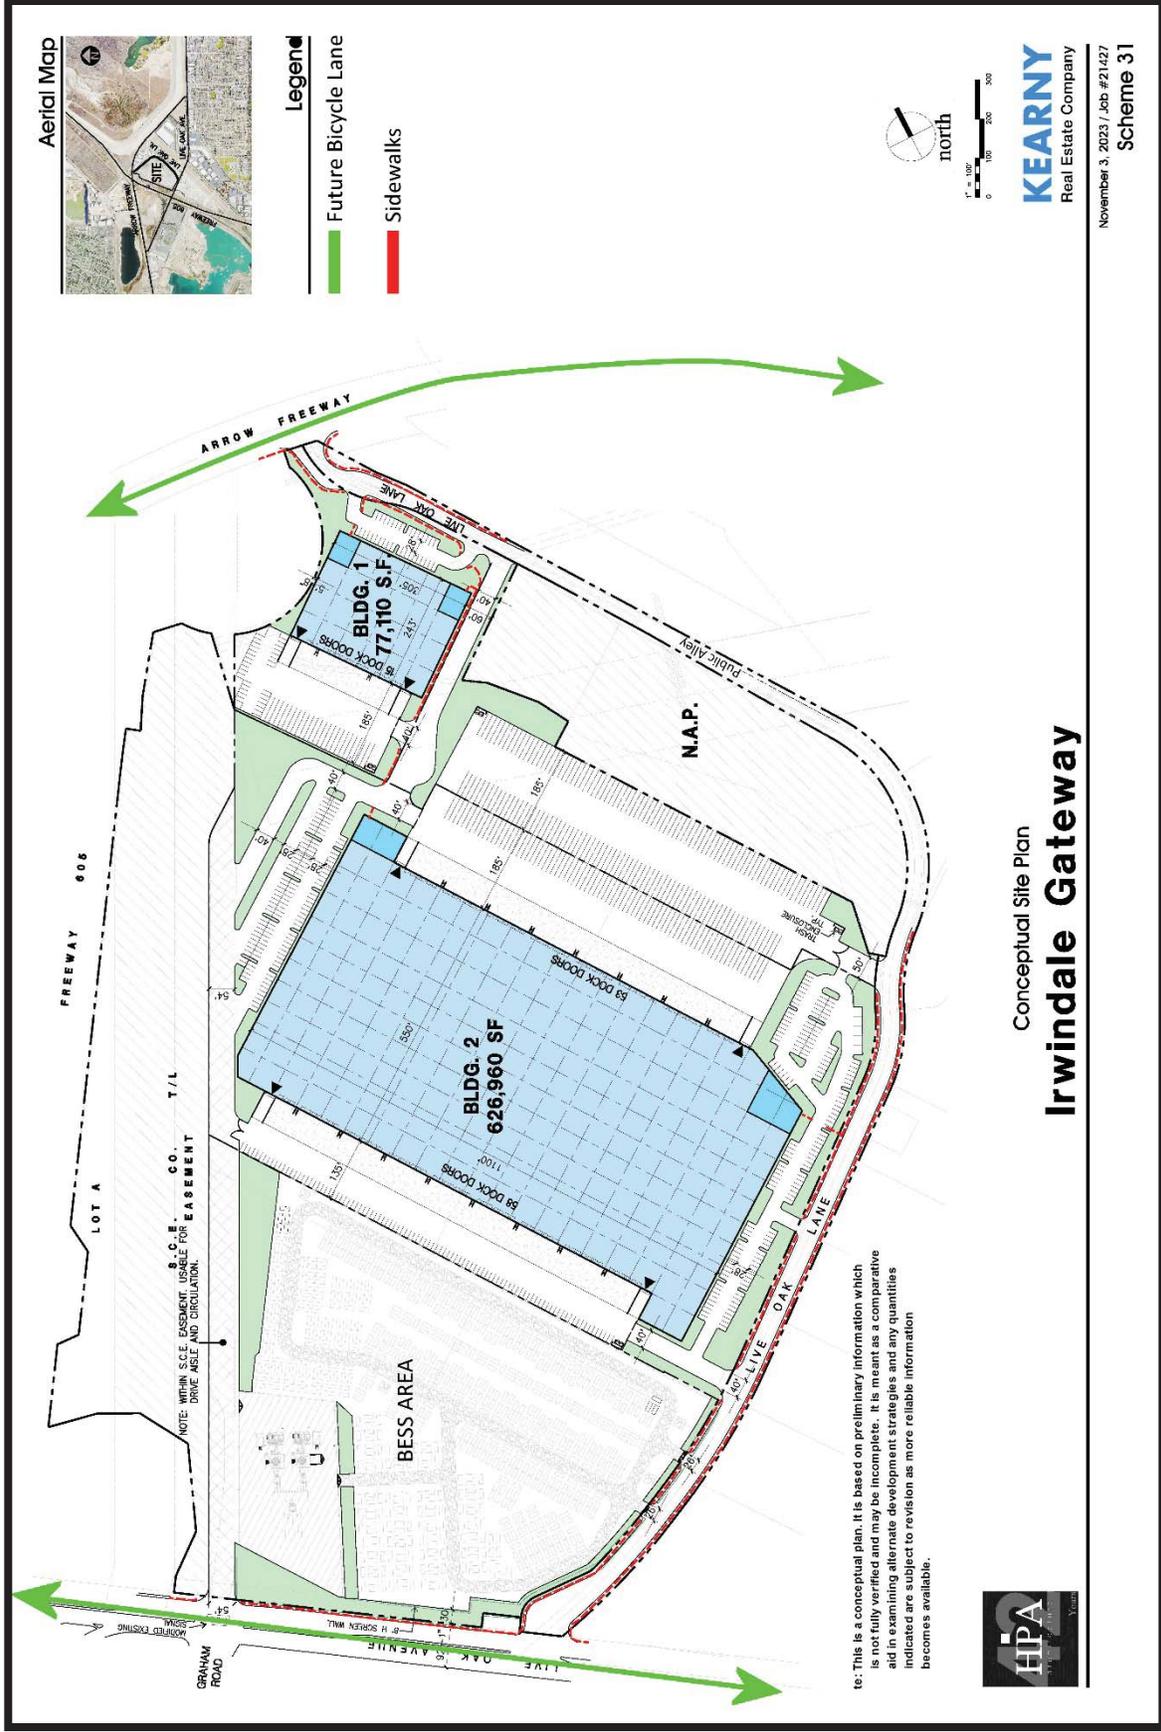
CONCEPTUAL NONVEHICULAR ACCESS PLAN WITH BESS
